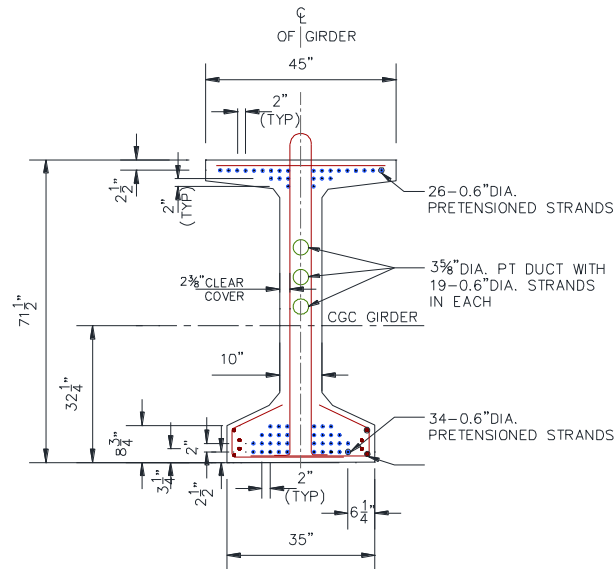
Cross Section of Modified Tx70 Girder (Hueste et al. 2014).
